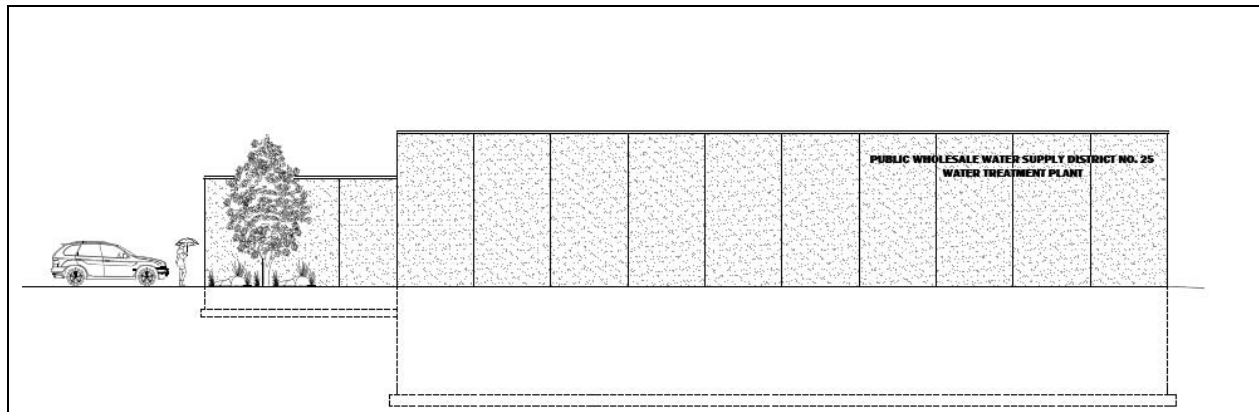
Drawing of proposed facility as viewed from N 1500 Road.
